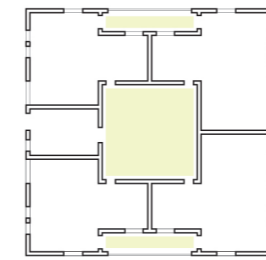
Schematic floorplan of the proposed courtyard typology.
